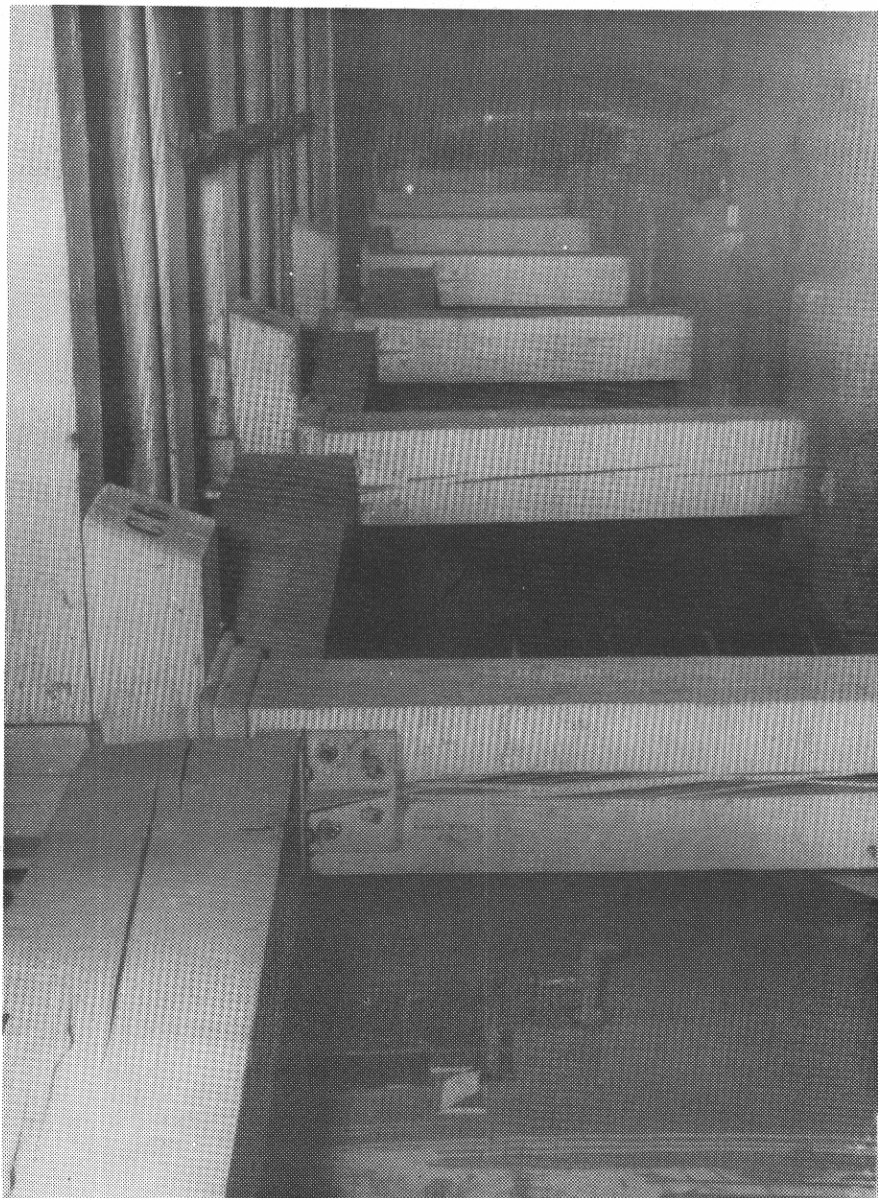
Heavy wood girders and short columns with deep seasoning checks. The checks may affect the strength of a girder but not of a short post.
